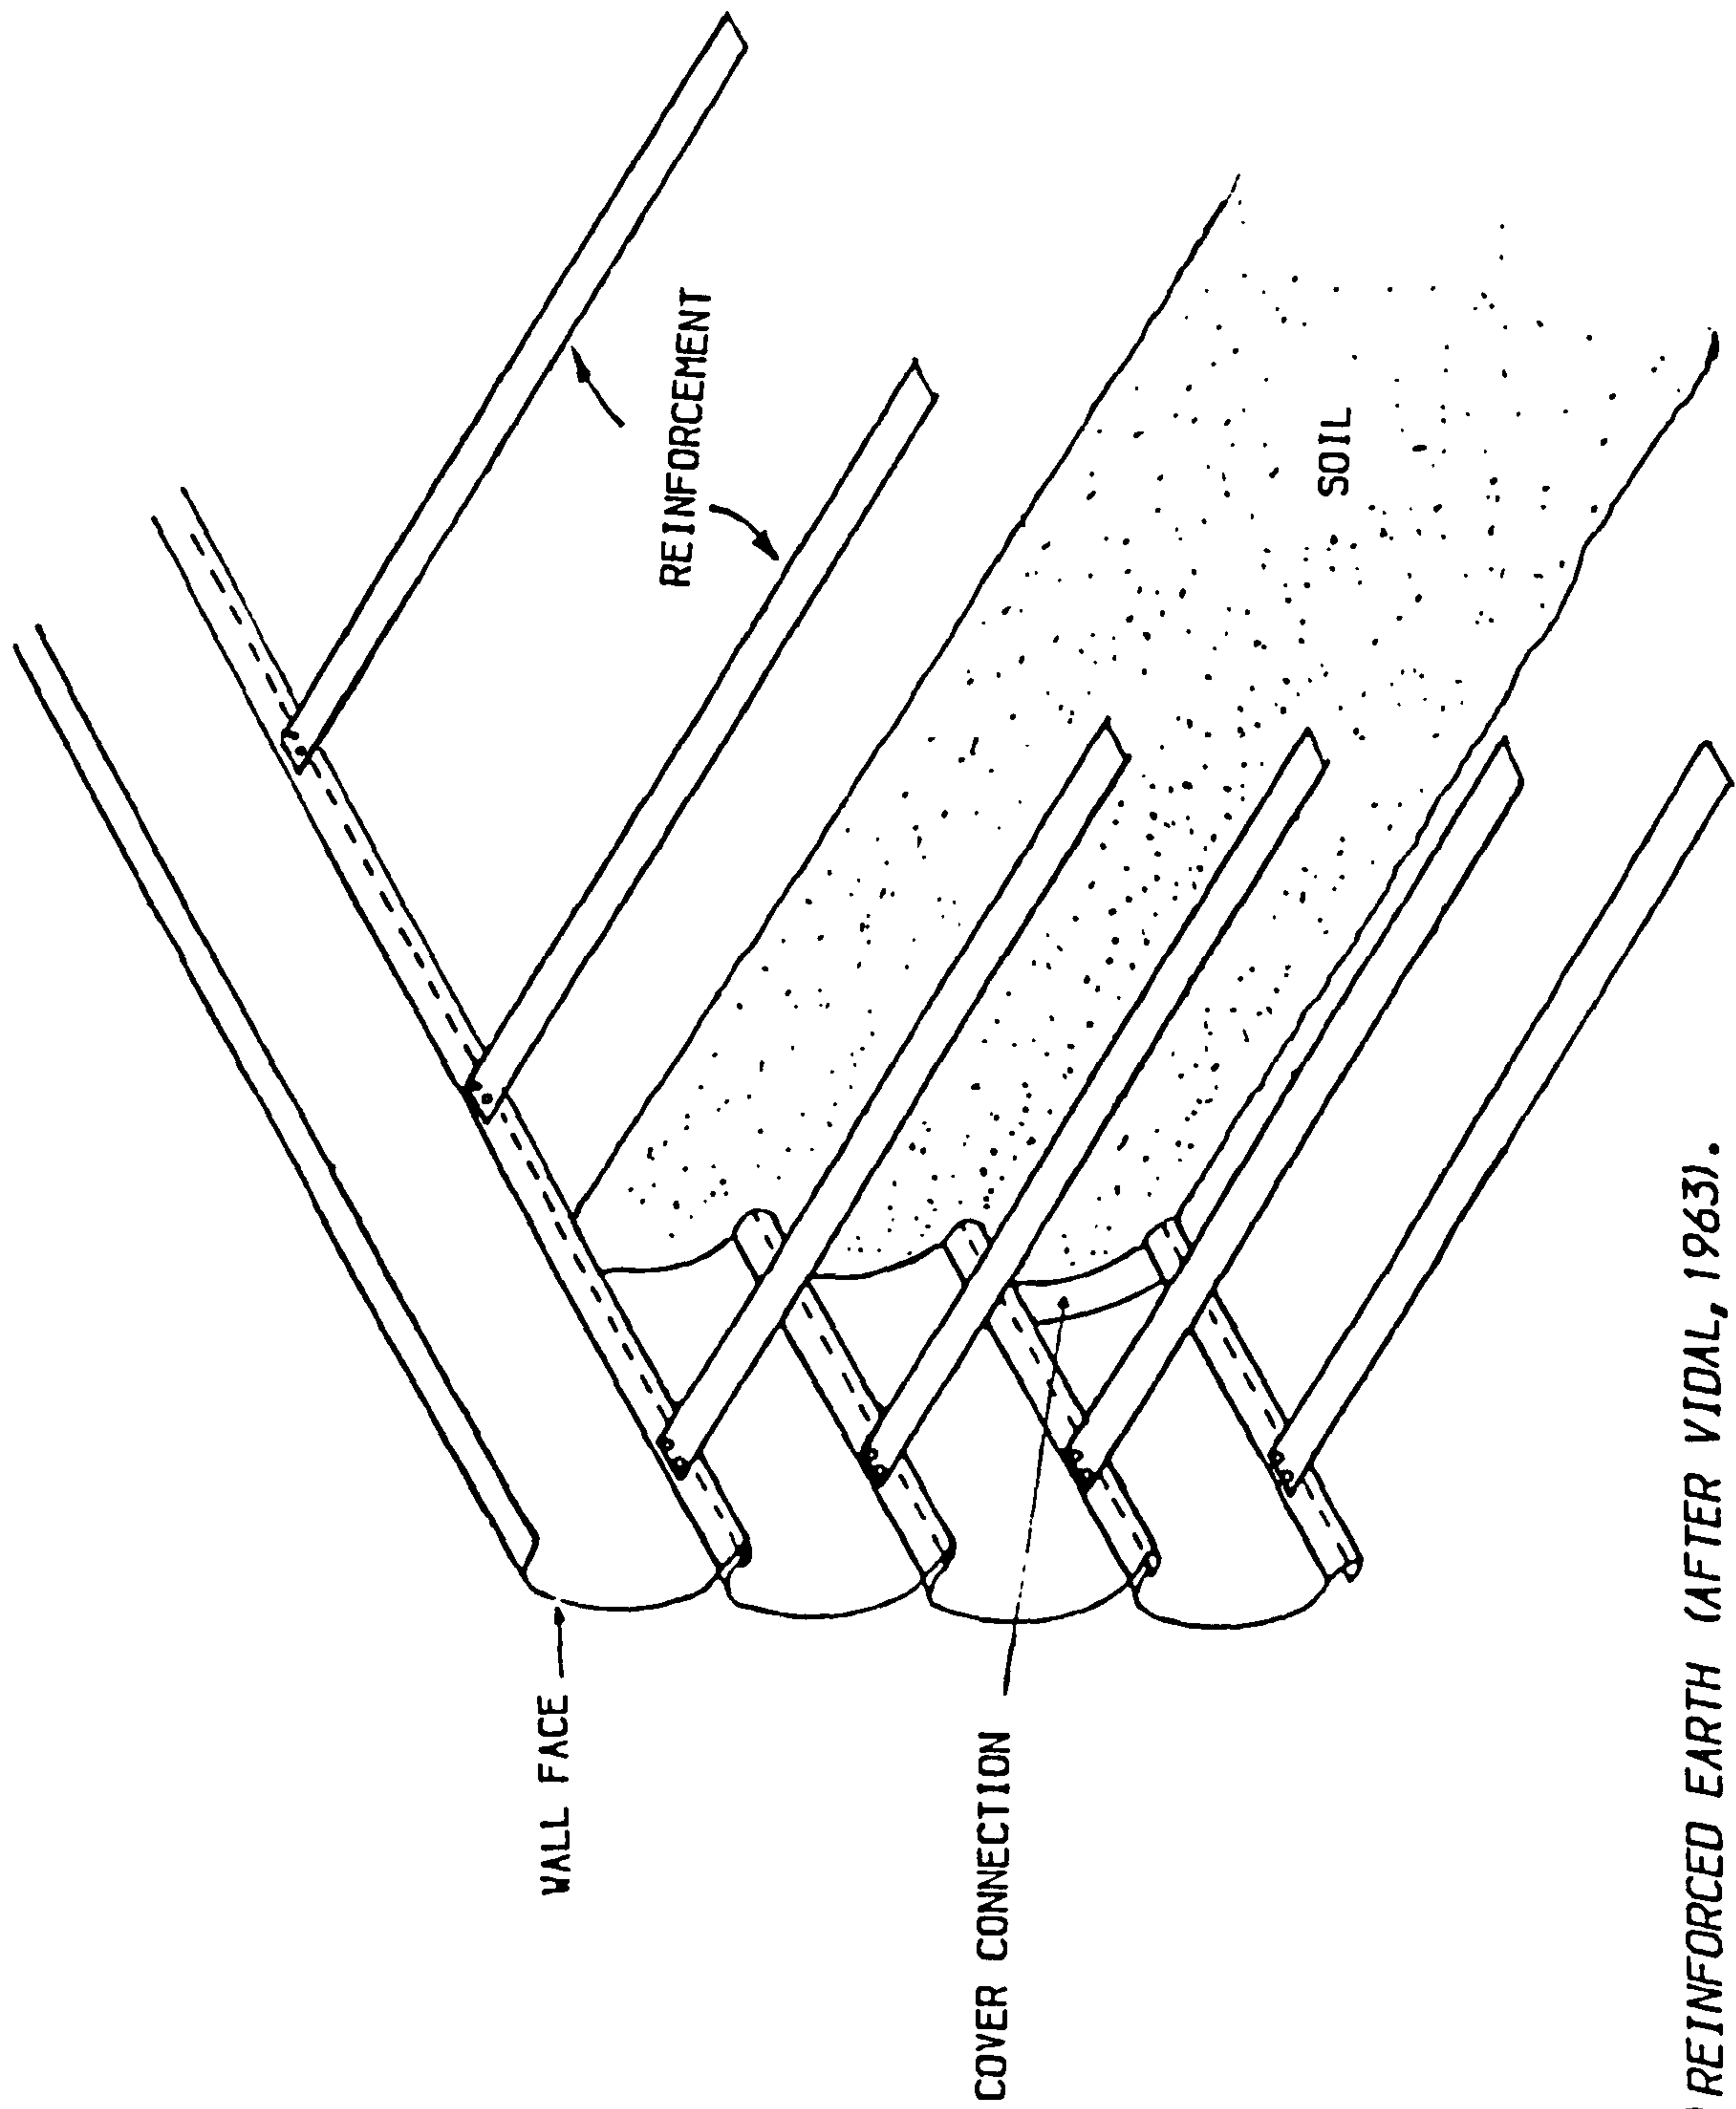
REINFORCED EARTH (AFTER VIDAL, 1963).
